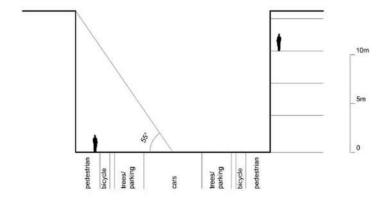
The proposed cross-section of the street assuming 14.5m high buildings - four storeys with services on the ground floor - Source: Author 2022
